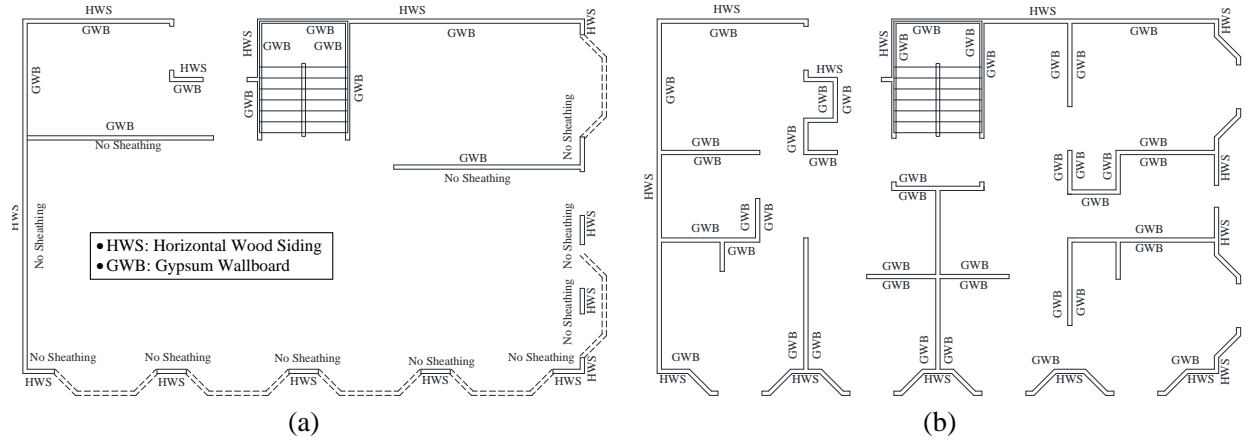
Existing wall sheathing in un-retrofitted building: (a) first story, (b) upper stories.
